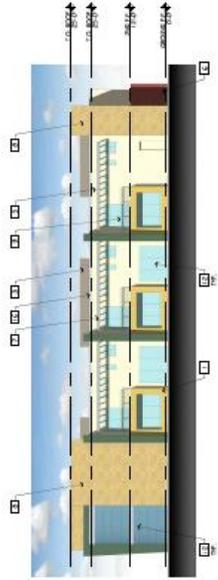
ARCHITECTURAL ELEVATIONS FOR BUILDING 1
